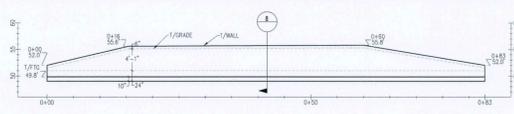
DETAILED SITE PLAN - DSP-22017 RECREATIONAL DETAILS & NOTES
